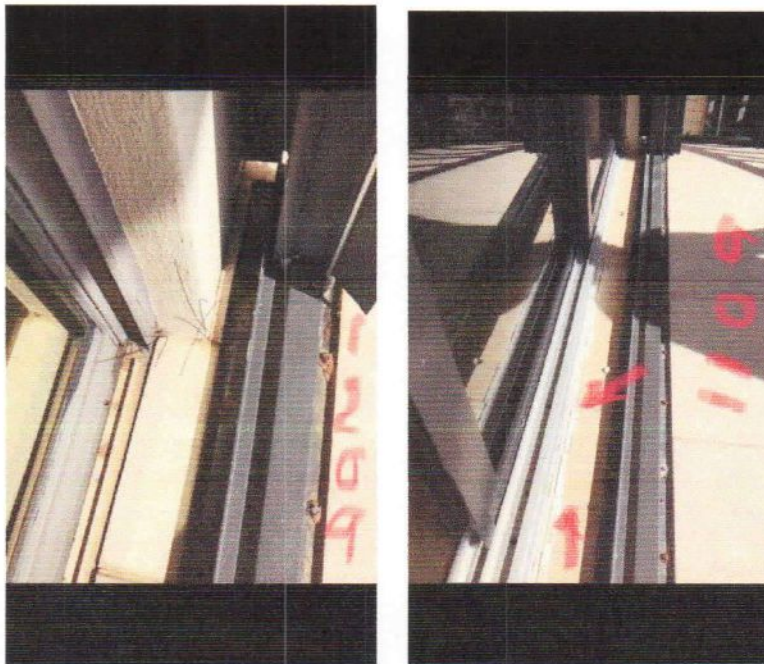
Exterior sealant past its serviceable lifespan at sealant between the window/door frames and masonry/concrete walls & balcony floors
